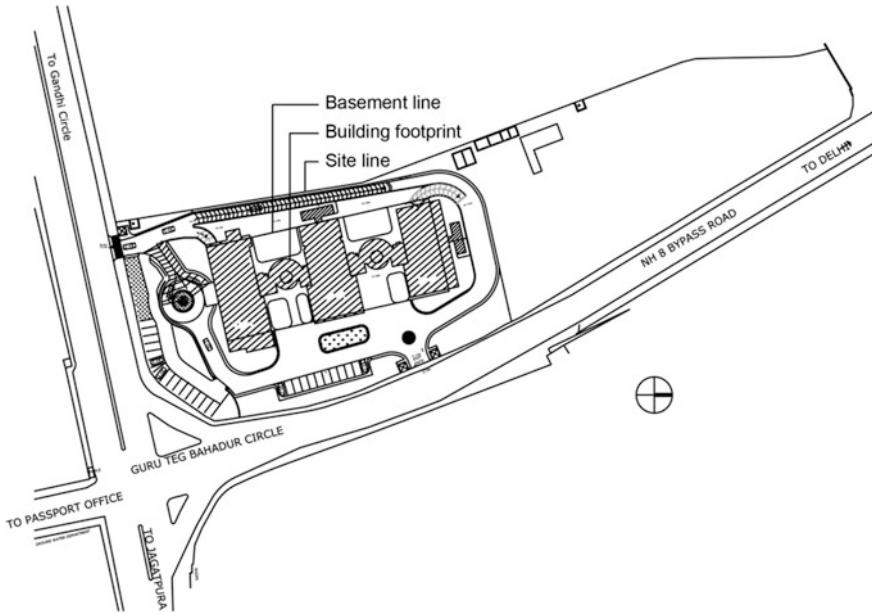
Site plan, Aranya Bhawan (© Mathur Ugam & Associates)
